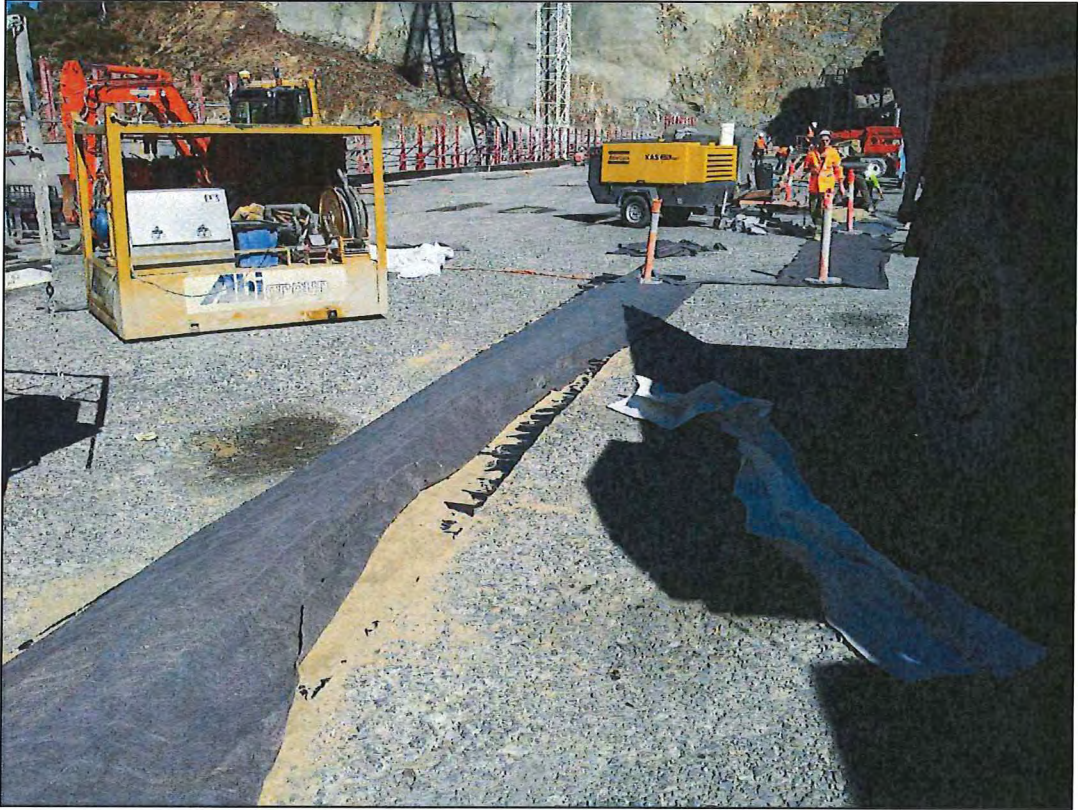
Sand crack stopper and strip drain being installed in Monoliths F and G
